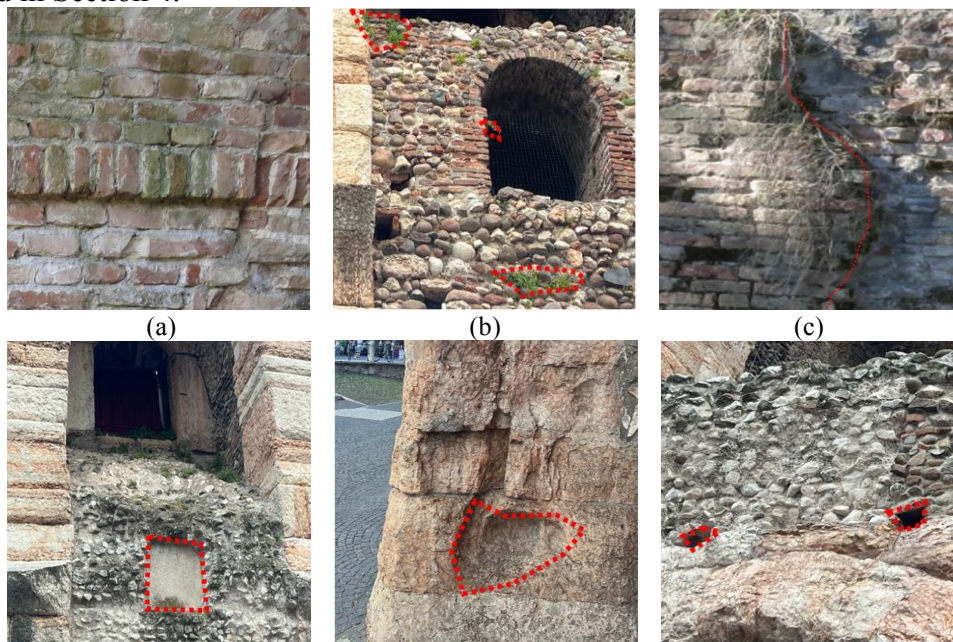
Examples of damage with different types in cultural heritage buildings. (a) Background, (b) higher plant, (c) cracks/discontinuous, (d) spalling, (e) efflorescence, and (f) erosion.
